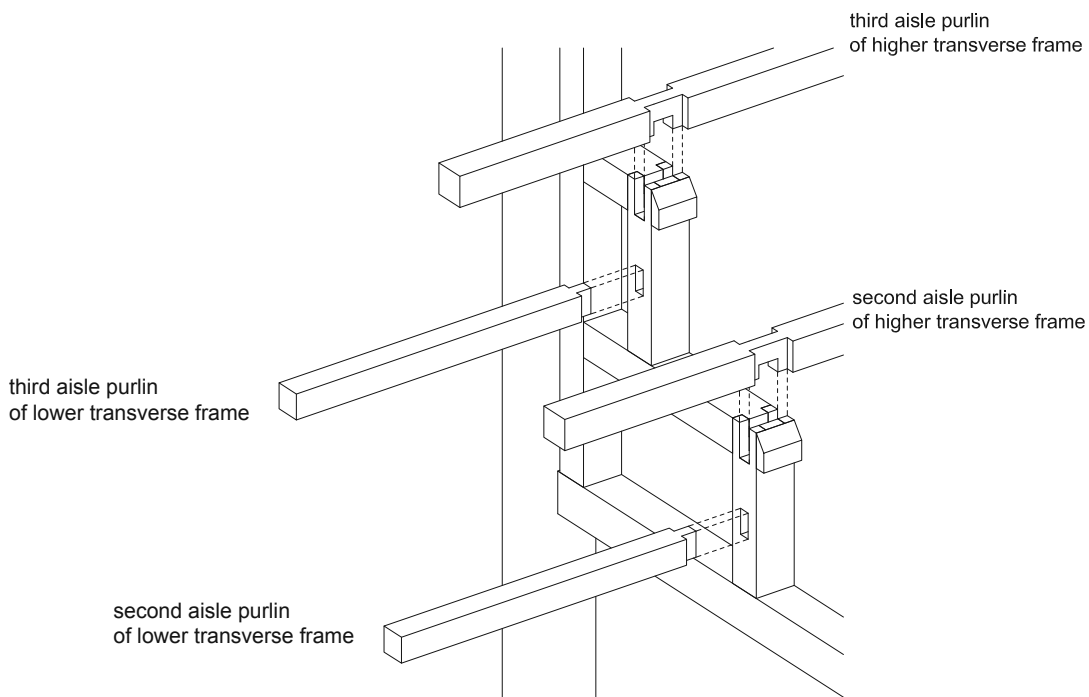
Purlins from the first bay meeting the second transverse frame in aisle roof
